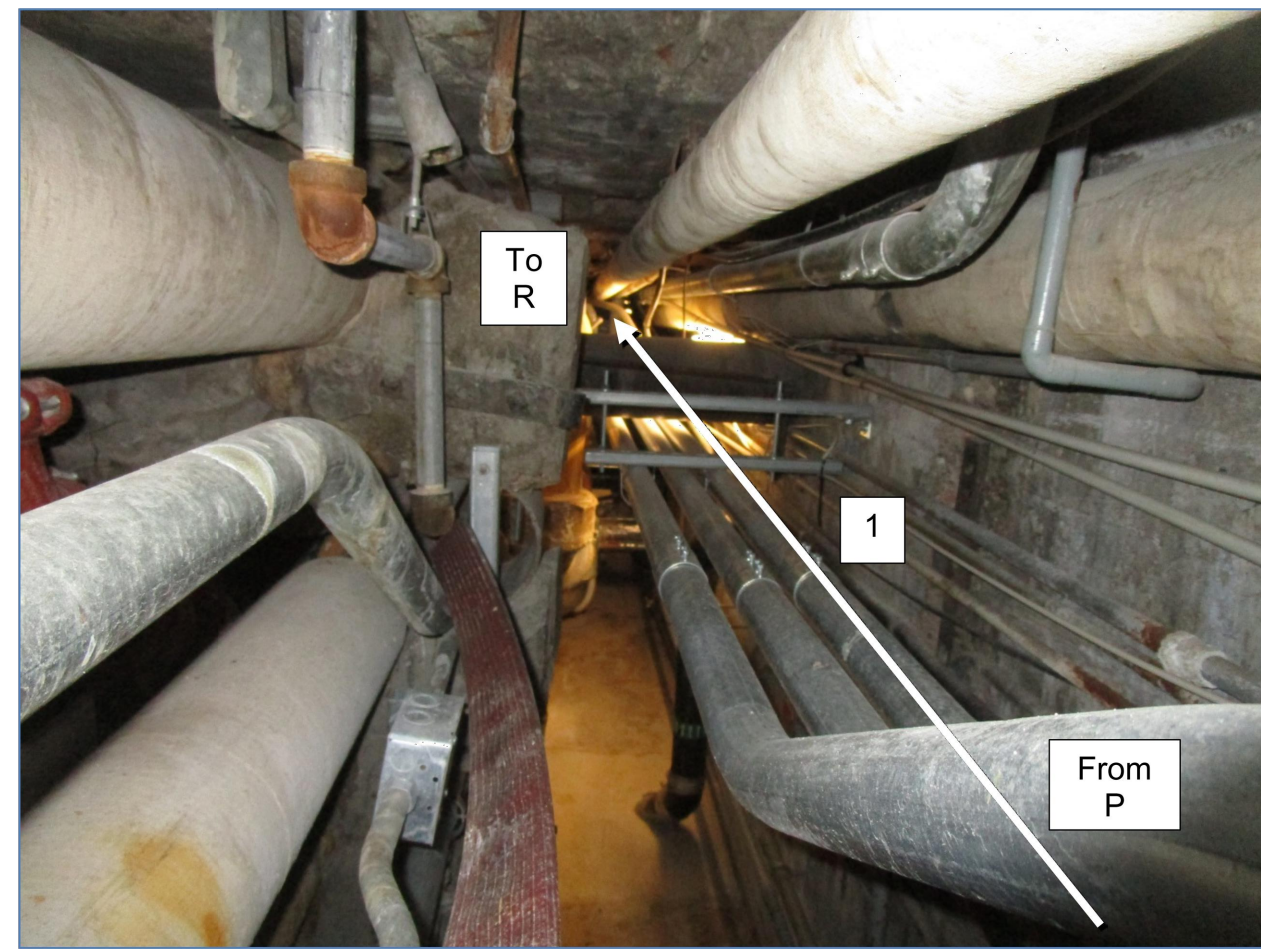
Location Q, conduit remains high, near tunnel ceiling
